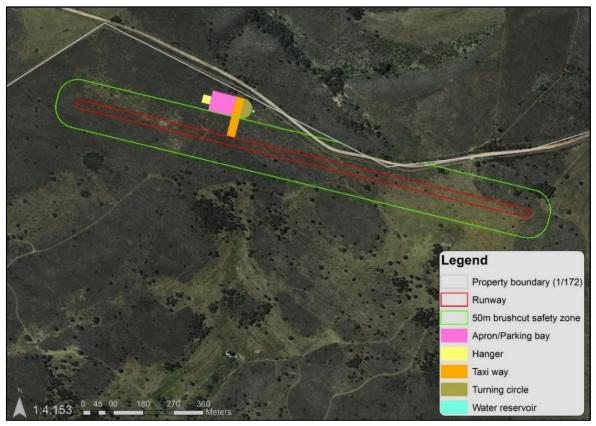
Site Plan for proposed runway on Portion 1 of Farm 172.
